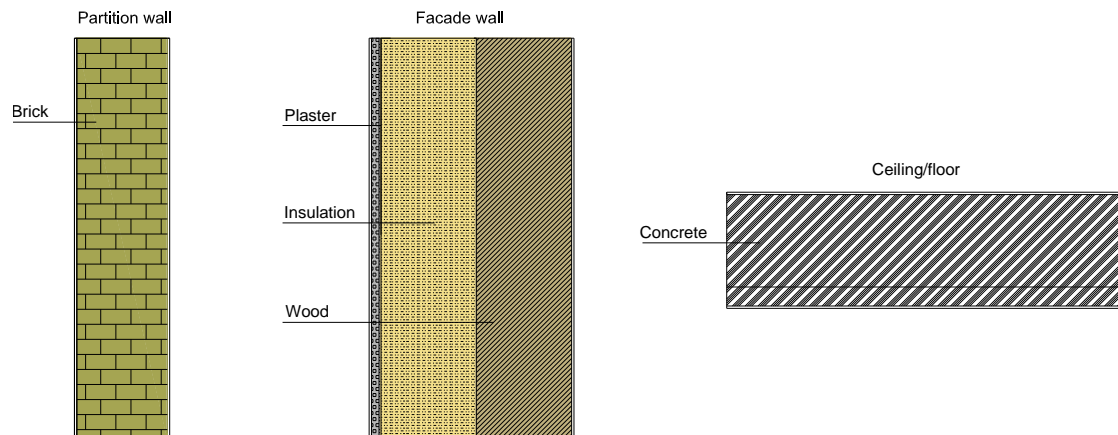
stratigraphic layout of the partition wall, the façade wall, the floor and the ceiling of the reference office room.
